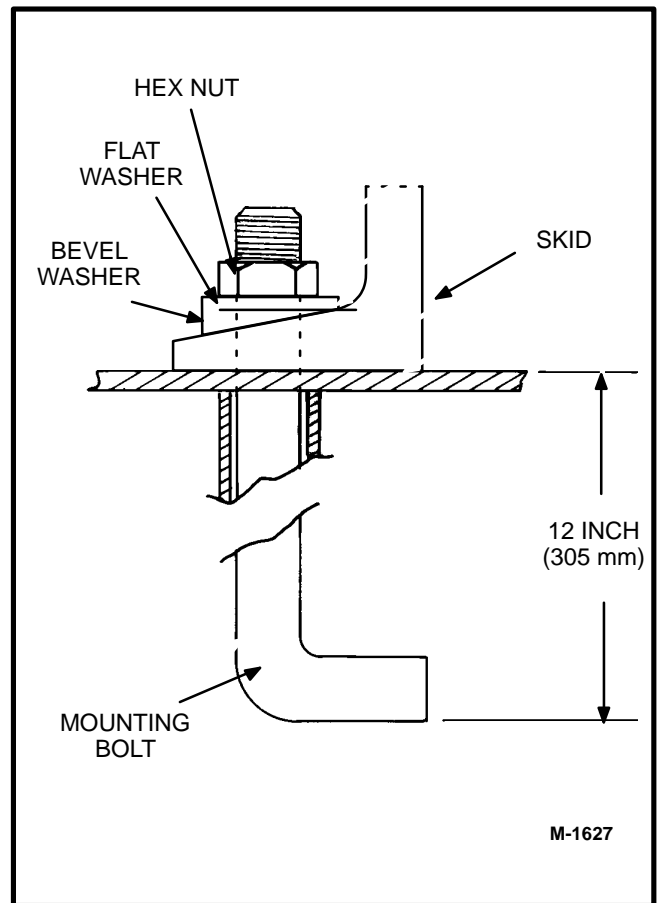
TYPICAL ANCHOR BOLT DIAGRAM
